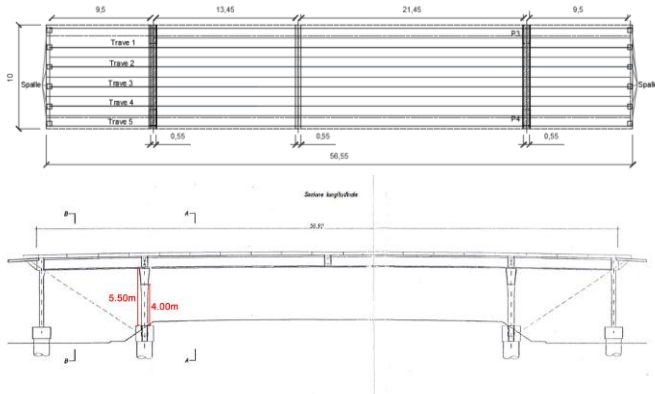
Plan view and cross section of the bridge / Pianta e sezione del cavalcavia.
